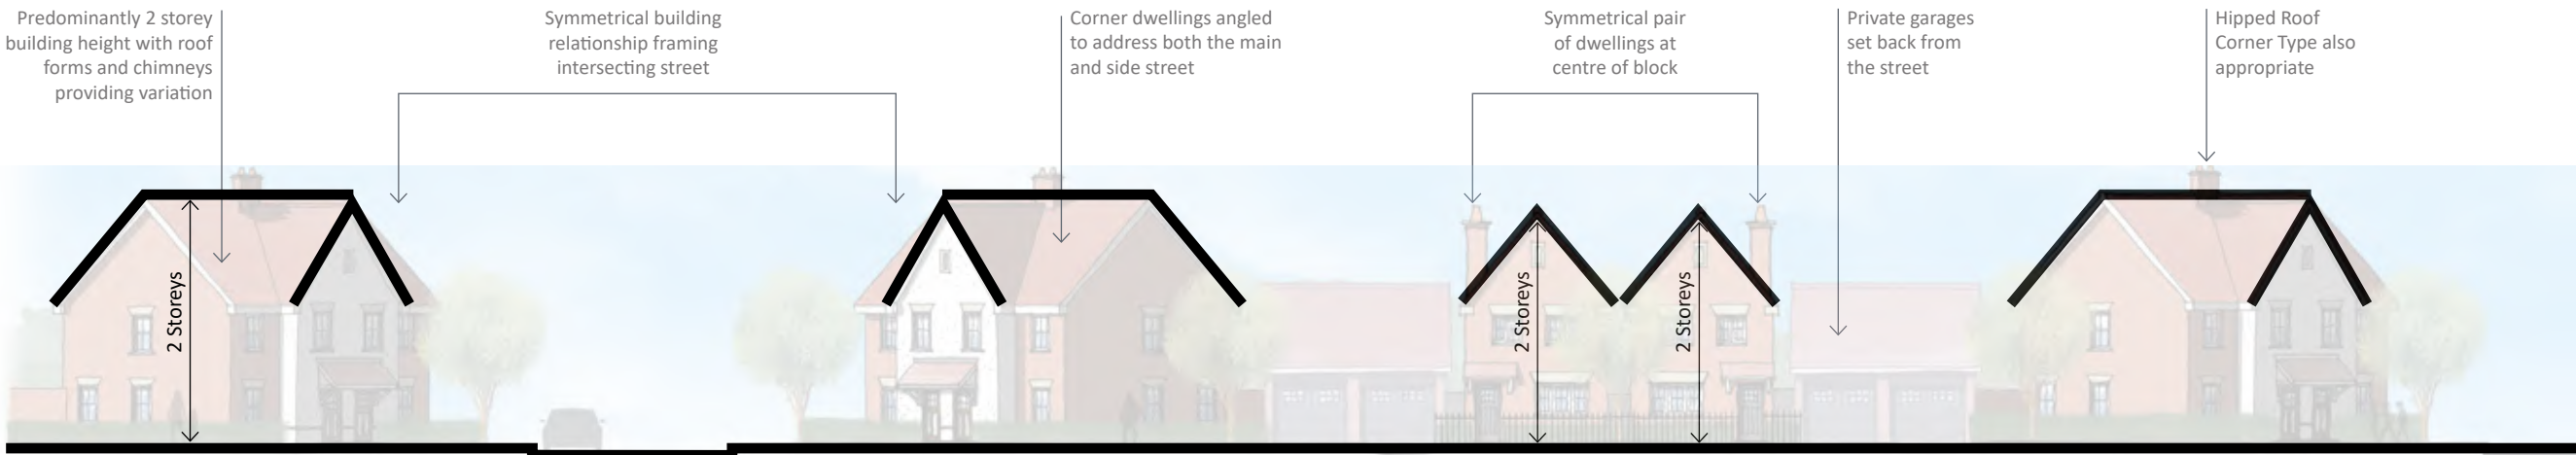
'HOT' STREET ELEVATION PRINCIPLES
